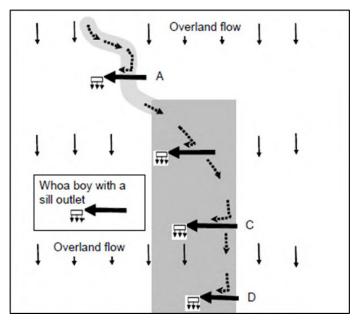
Whoa-Boys - Allow Overland Flows - Cross Access Track Pavement
